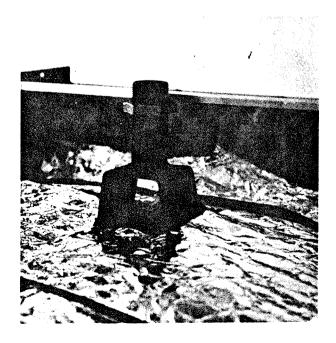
Adjust threaded nut (1) on suspension stud. Level with upper edges of side panels.
